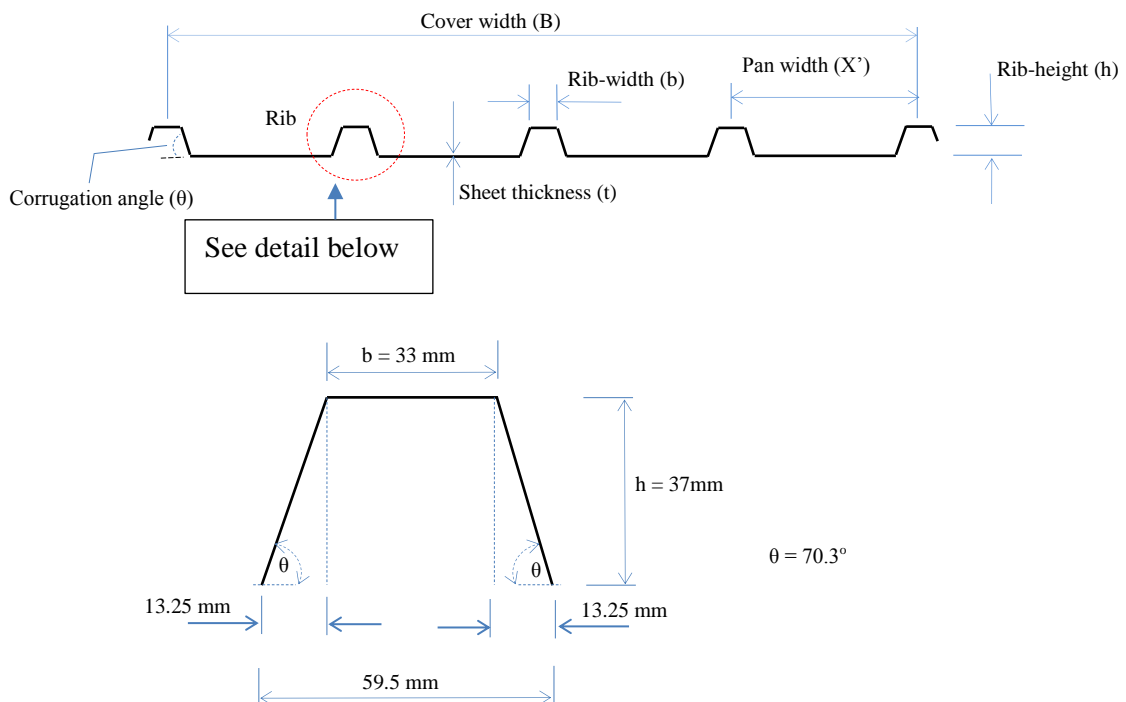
A cross-section of a typical IBR sheet, including a depiction of the details of a rib (not to scale)
